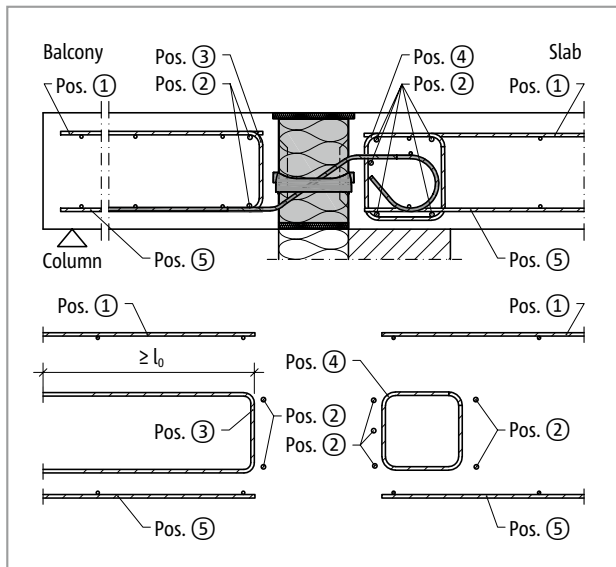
Schöck Isokorb® XT type Q-V1 to V4: On-site reinforcement
